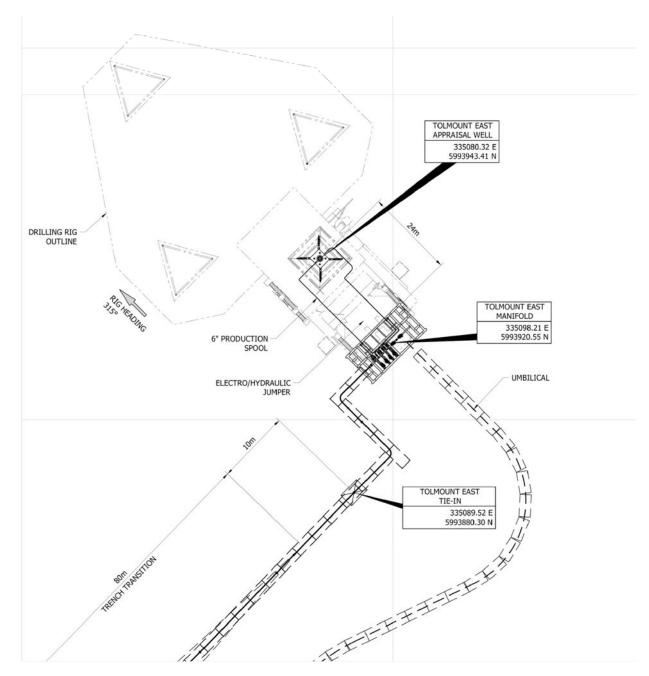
Drilling rig and subsea structure layout at Tolmount East
